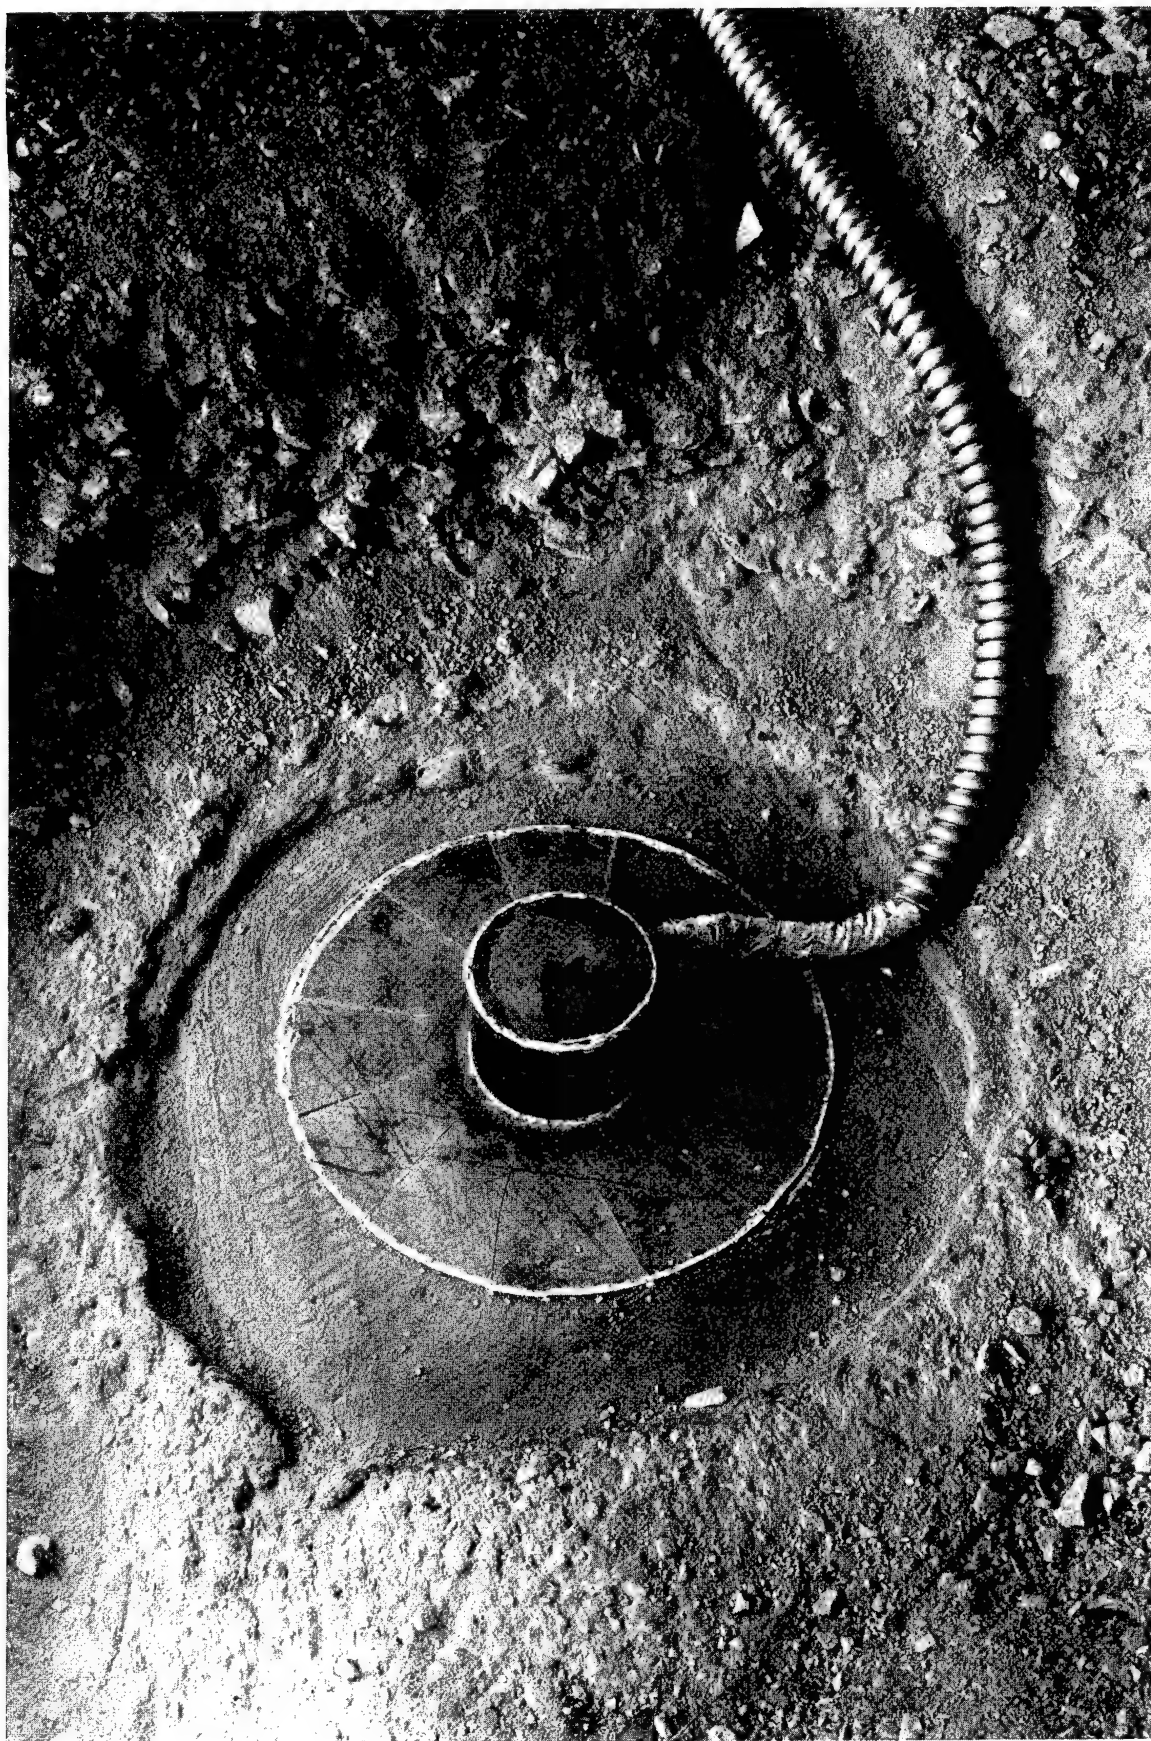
Close-up of B-36 assembly loaded to 200,000 lb
